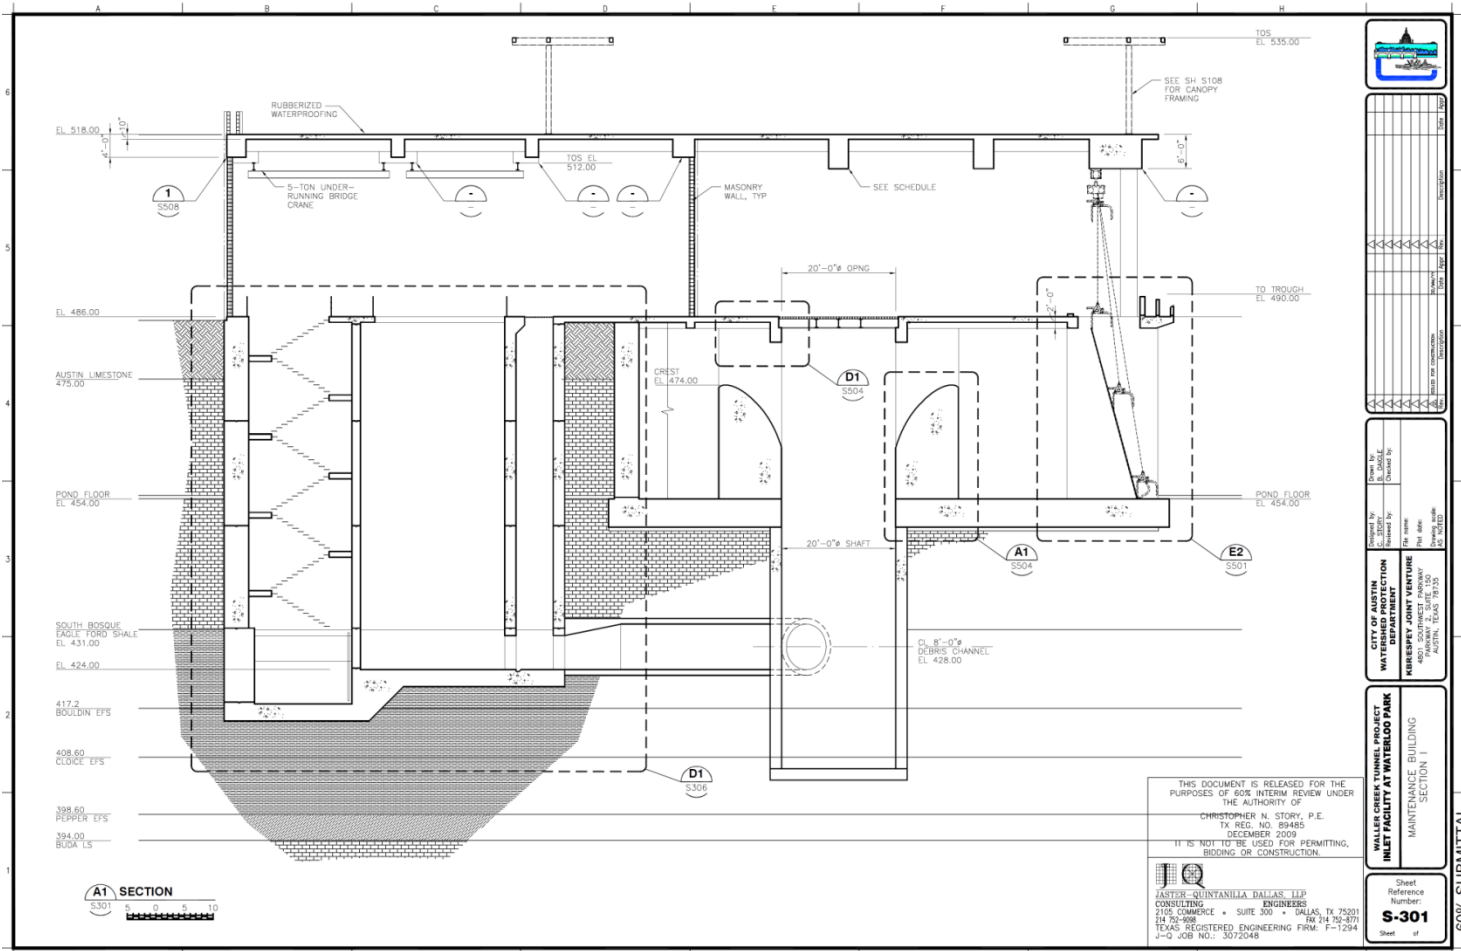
Waller Creek Tunnel Project; Morning Glory Spillway – Section
